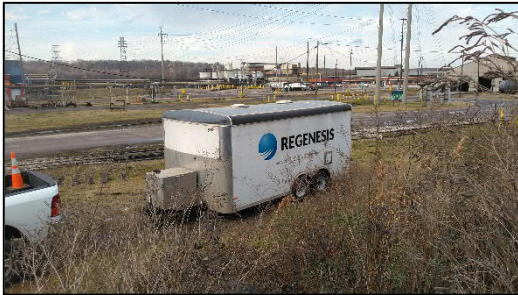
RRS injection trailer staged onsite. (Jan 27, 2021)
